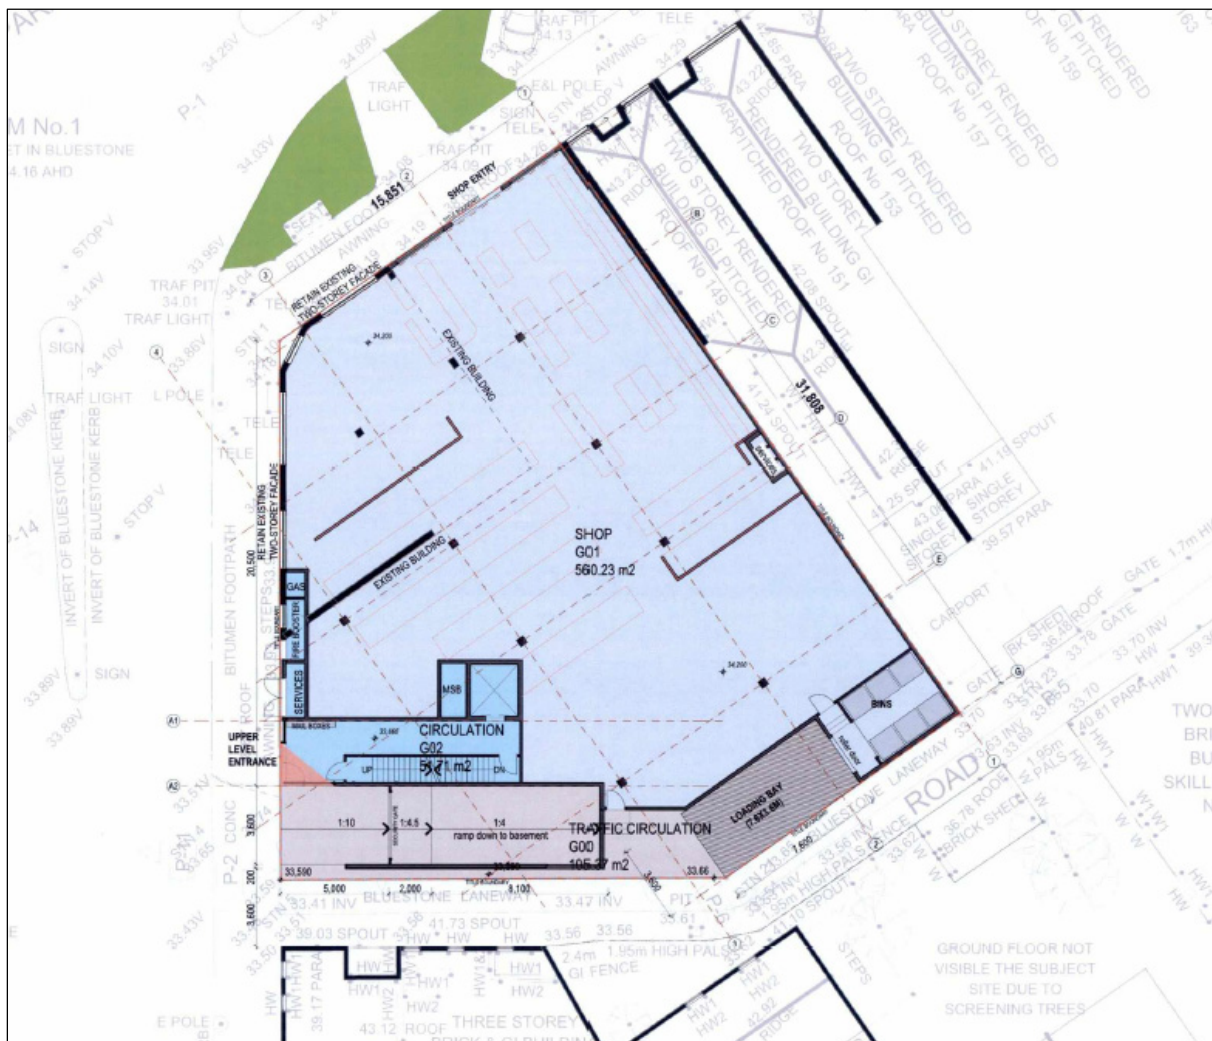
Extract of Ground Floor Plan for 141-147 Queens Parade
